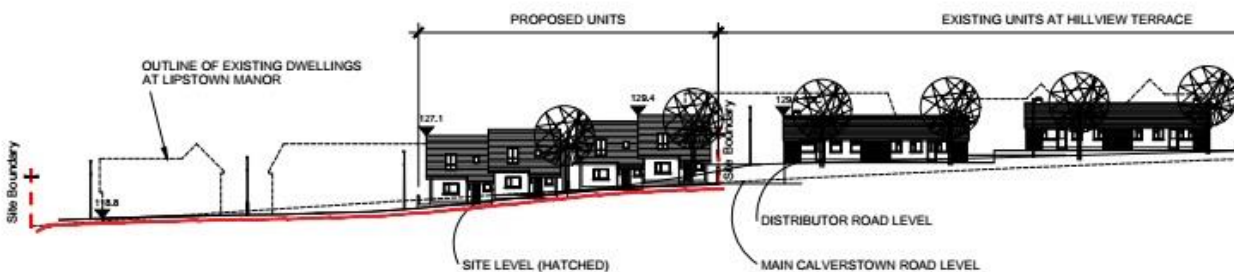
Proposed context elevation to Hillview Terrace (not to scale).
